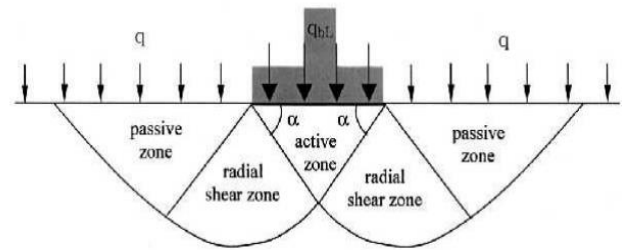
Typical Failure Mechanism of Axially Loaded Footing
